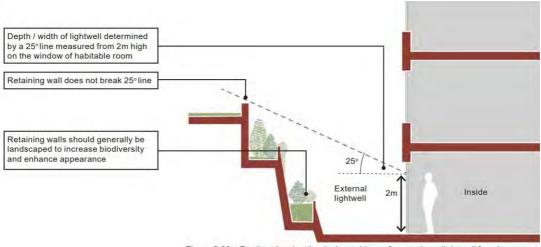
Section showing the design guidance for creating a light well for a basement or lower-ground floor.
